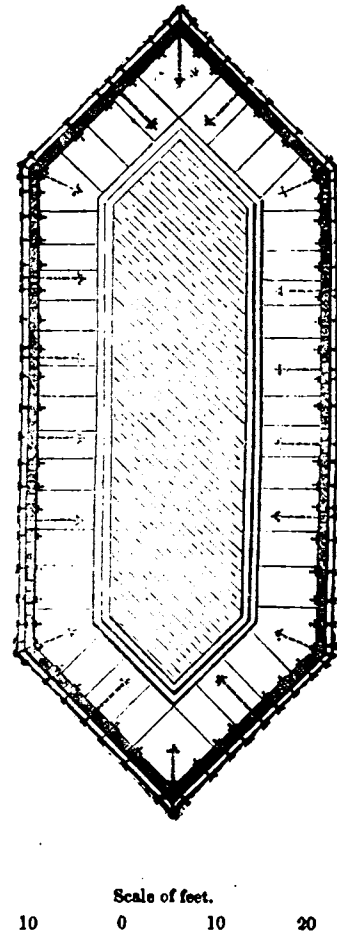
PLAN of PIER, showing the Sheet-piling and Stone-capping.
